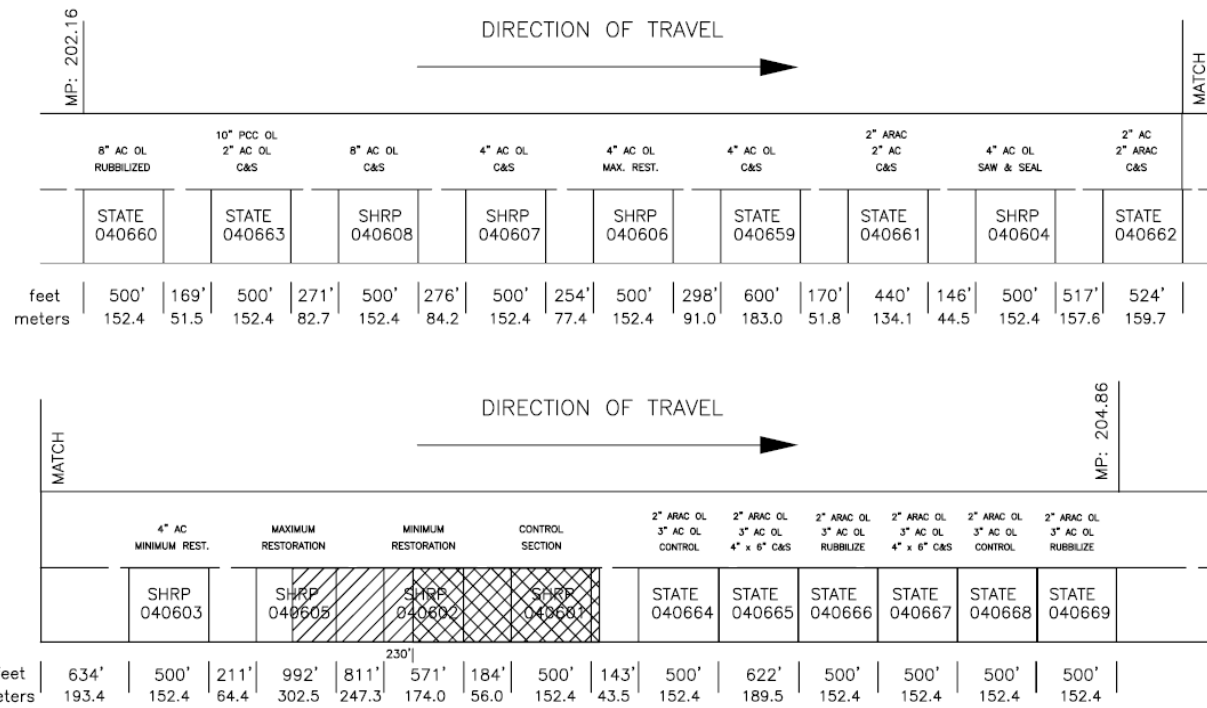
Existing Concrete Pavement Section Before SPS-6 Project Construction.
